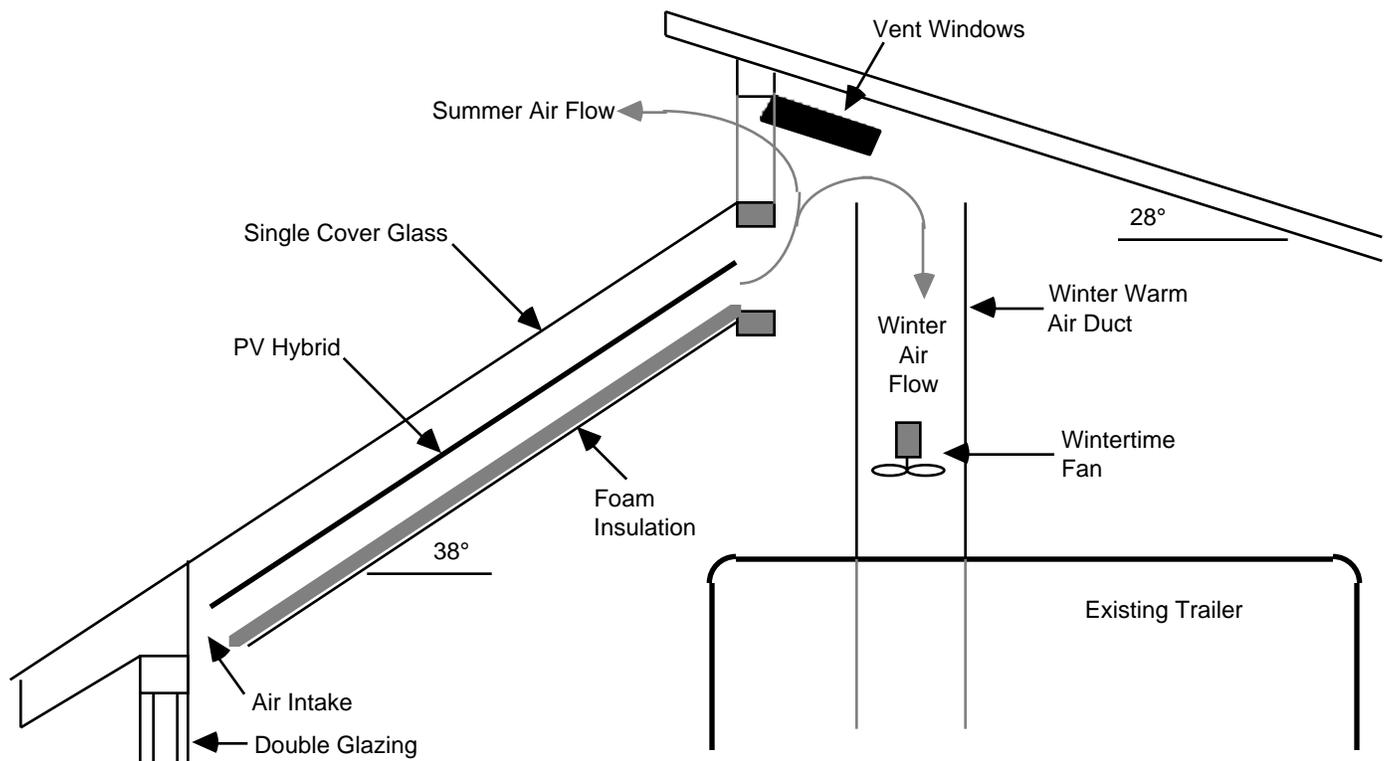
Cross-section of Solar Dwelling Showing Sunspace
